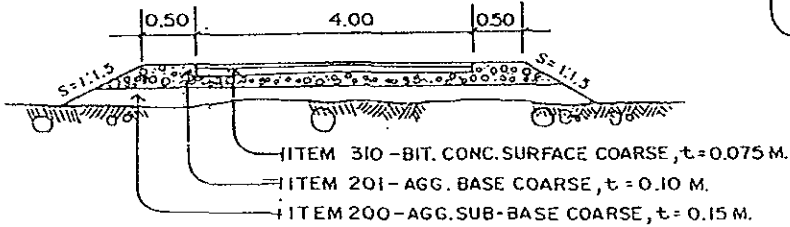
Typical Cross Section of Barangay Road (2)
